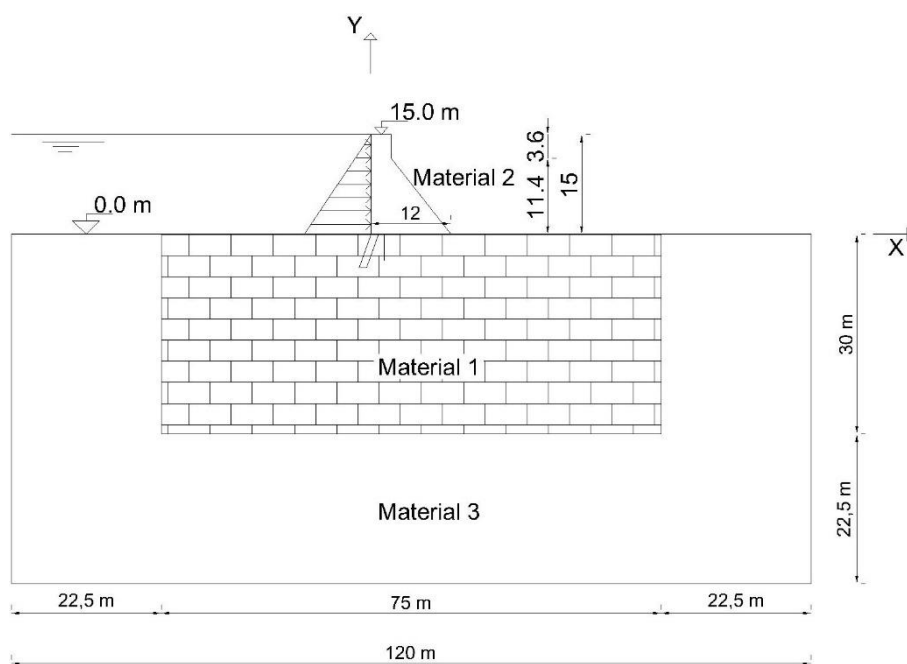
Model geometry of the dam considering grout curtain and drainage system
